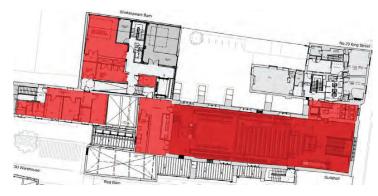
Areas to be provided with a voice alarm system (G+1 floor)
